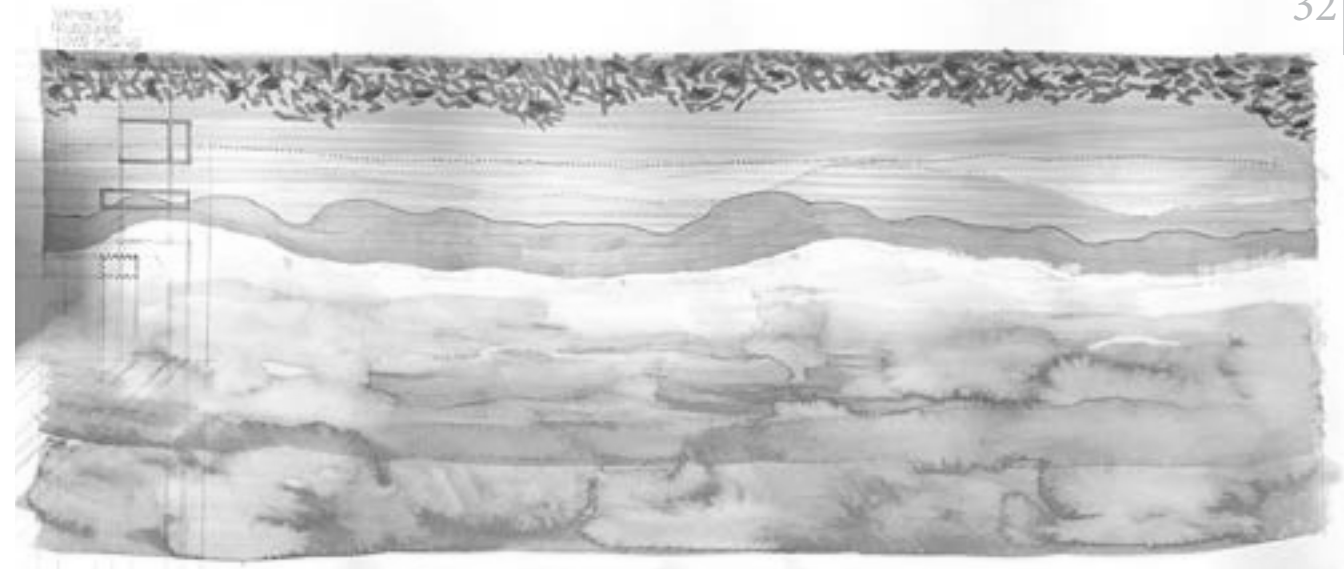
Plan view orthographic. (Created by Author, *Opoutere Plan View*).
